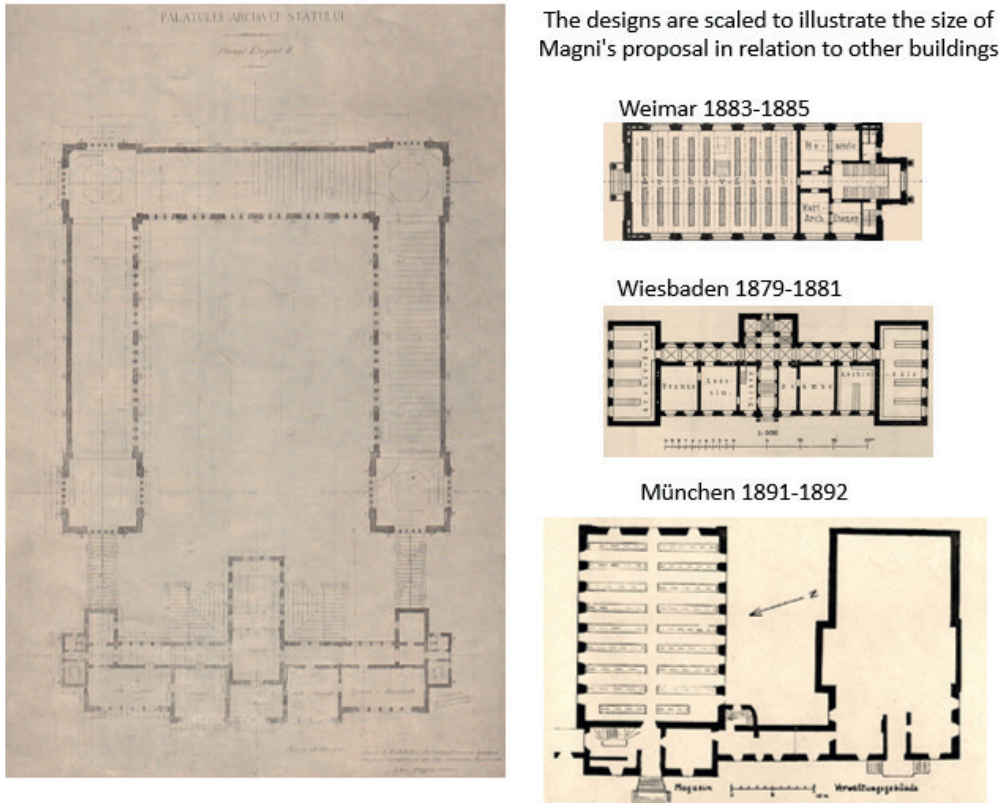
Many plans for archive buildings ran parallel to Magni's project. The plans are scaled to show the size of the proposed building.
